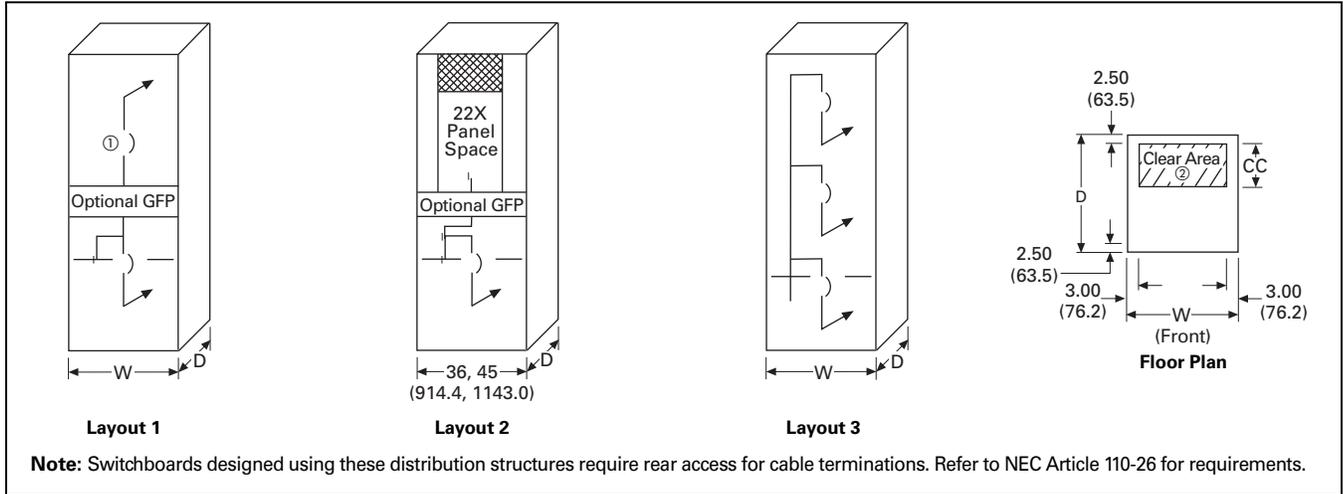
Individually Mounted Feeder Layouts—Dimensions in Inches (mm)
